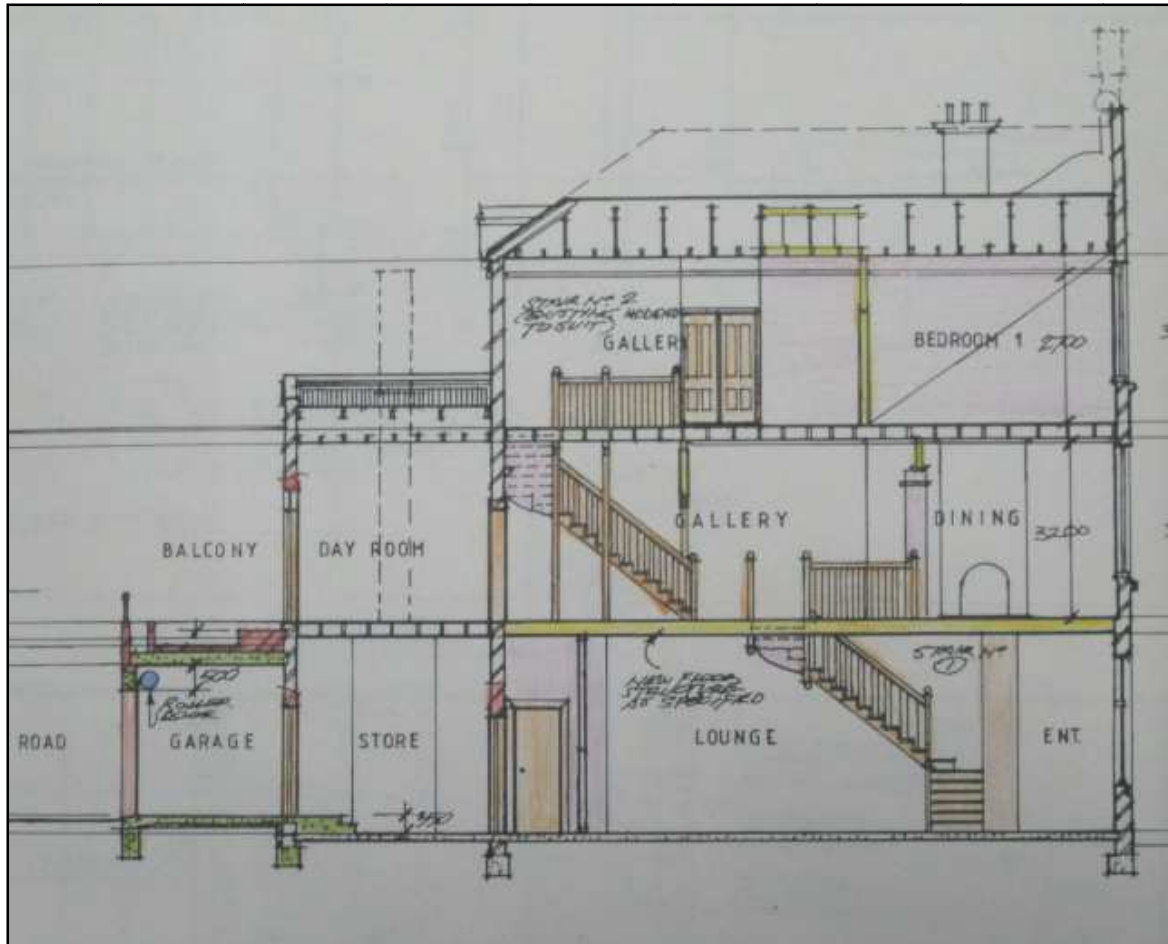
Section through former hotel showing rebuilt stair (MCC BA60692)
